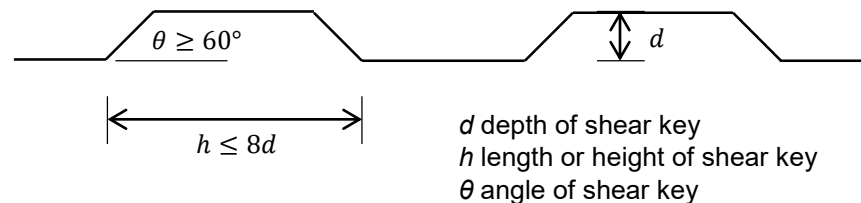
DETAILING OF SHEAR KEY WITHOUT REINFORCEMENT
